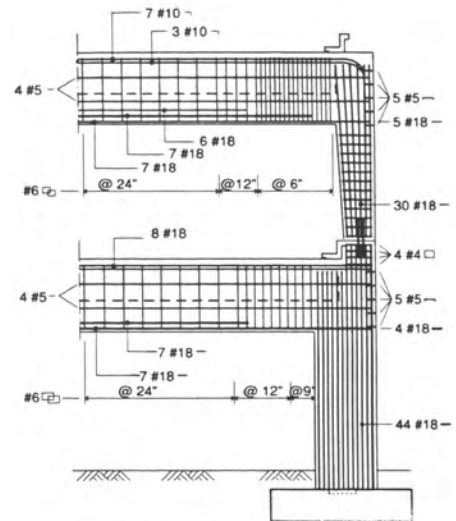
Detail of Typical Bent [from Housner (1990)]
